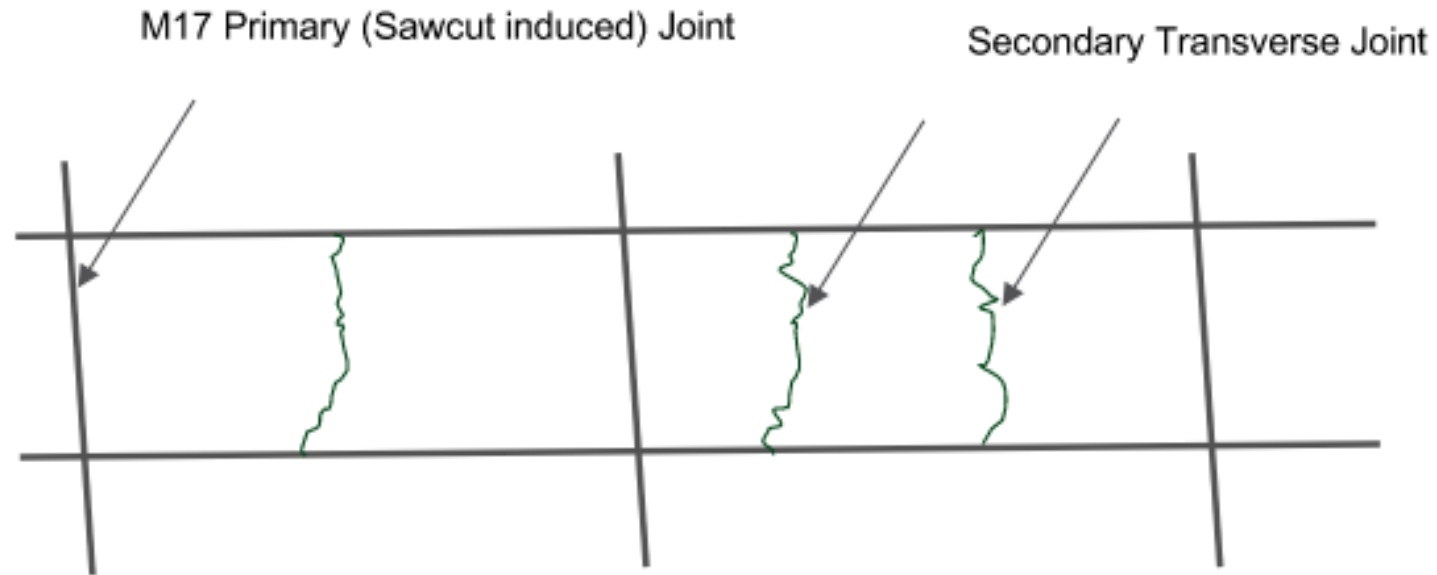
Typical MRCP jointing detail showing typical Primary and Secondary planned joints
